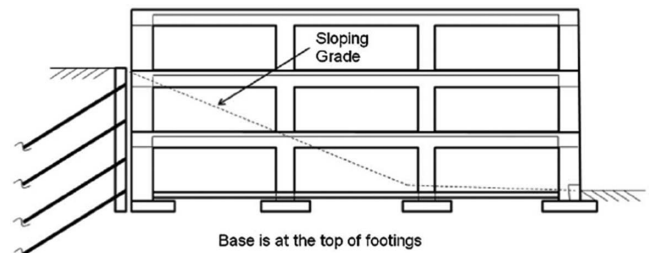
Building with tie-back or cantilevered retaining wall that is separate from the building.
